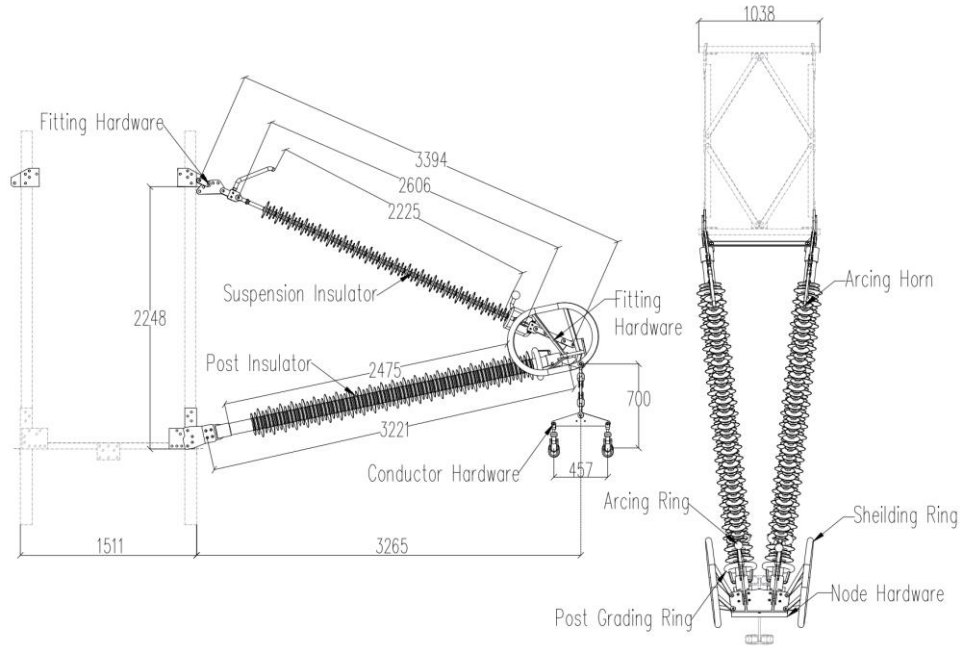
Outline drawing of insulated crossarm (all dimensions in mm).
